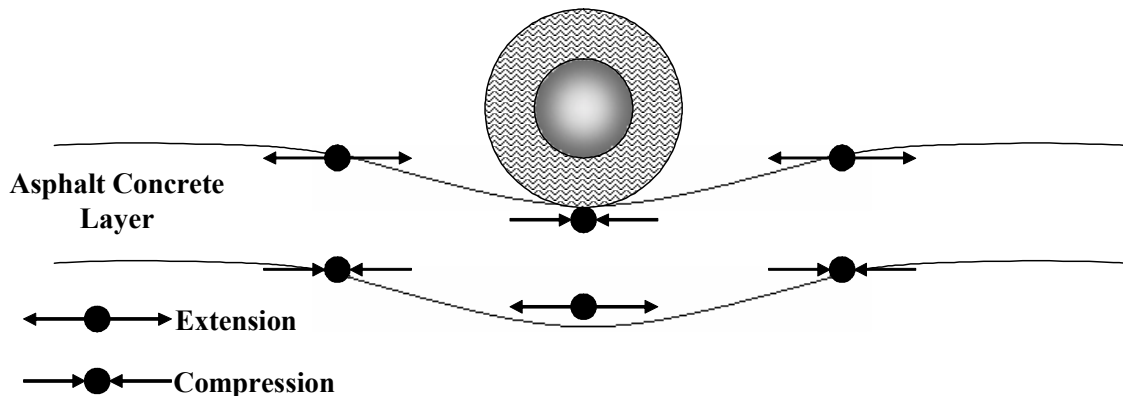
Cross Section of Stress Reversal in Flexible Pavement Wheel Path
